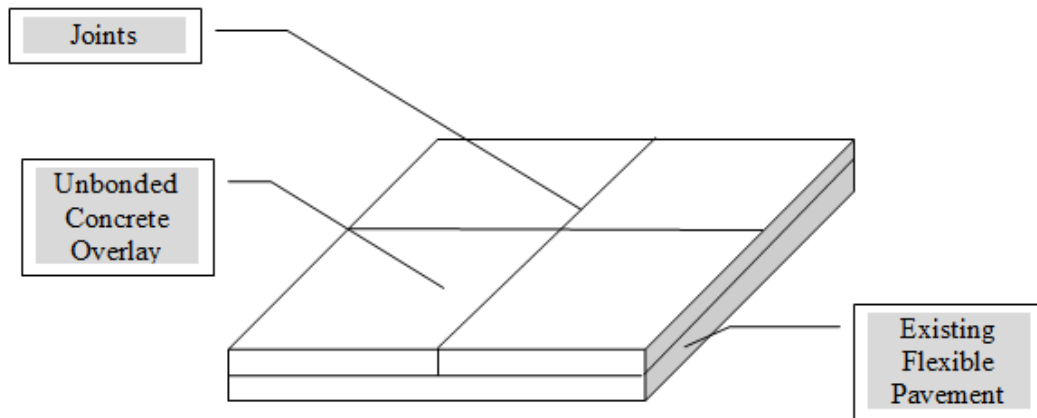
Unbonded concrete overlay of flexible pavement. (Illustration: Joe Mahoney)
